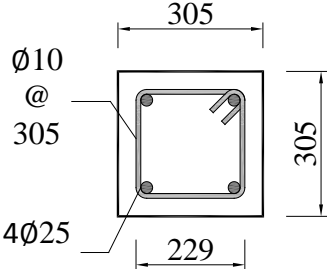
Cross section of a typical NRC column specimen (dimensions in mm)
